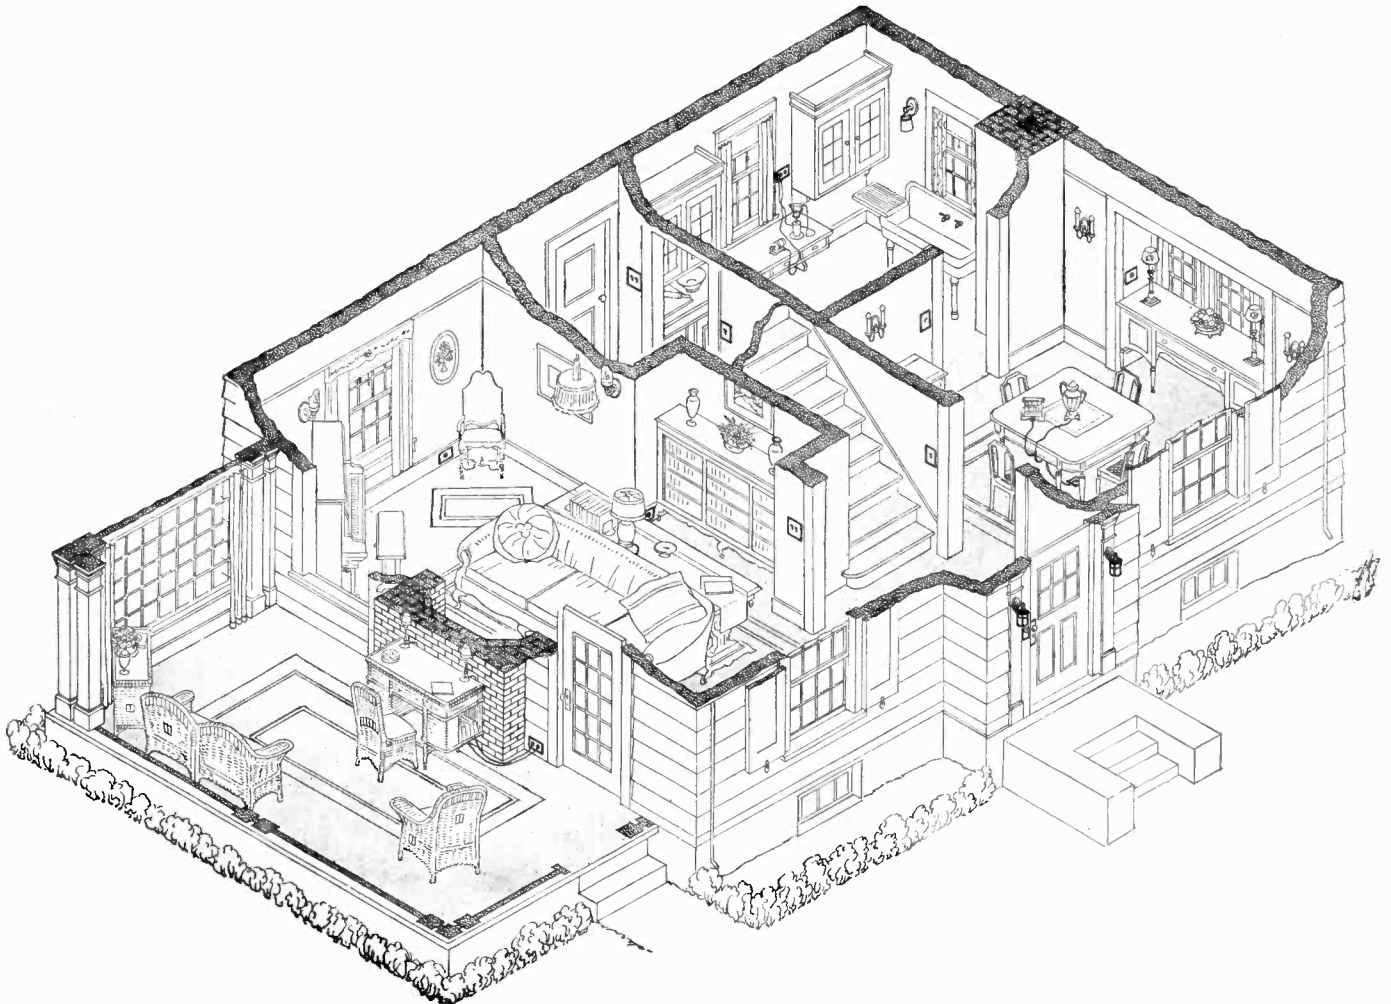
Sectional view of ground floor of a house, showing the location and arrangement of lights, switches, and convenience outlets.
